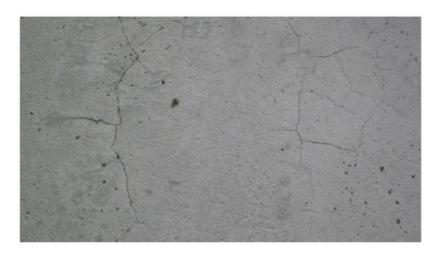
Early-age random cracks that occurred in a concrete floor slab; most of these cracks appeared within 42 days after placing of concrete; the slab was cured using thermal curing blanket.
